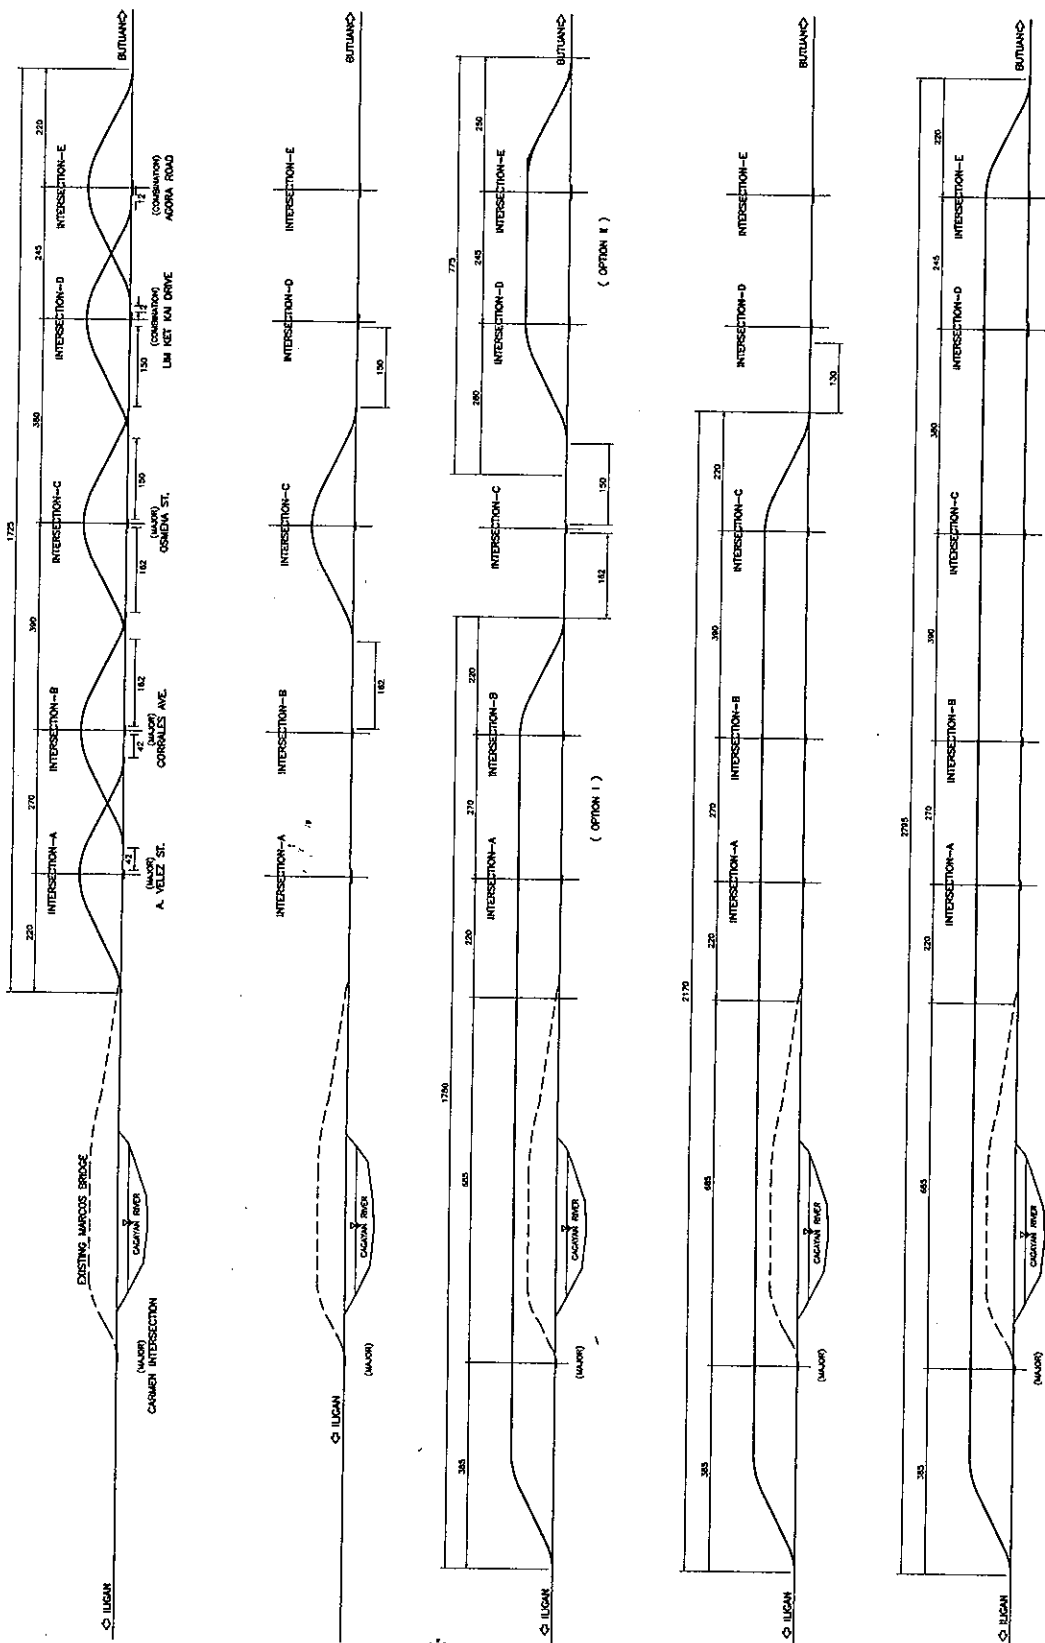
(2/2) CONSTRUCTION OF A BYPASS ROAD AT PLATEAU AREA : PROFILE
